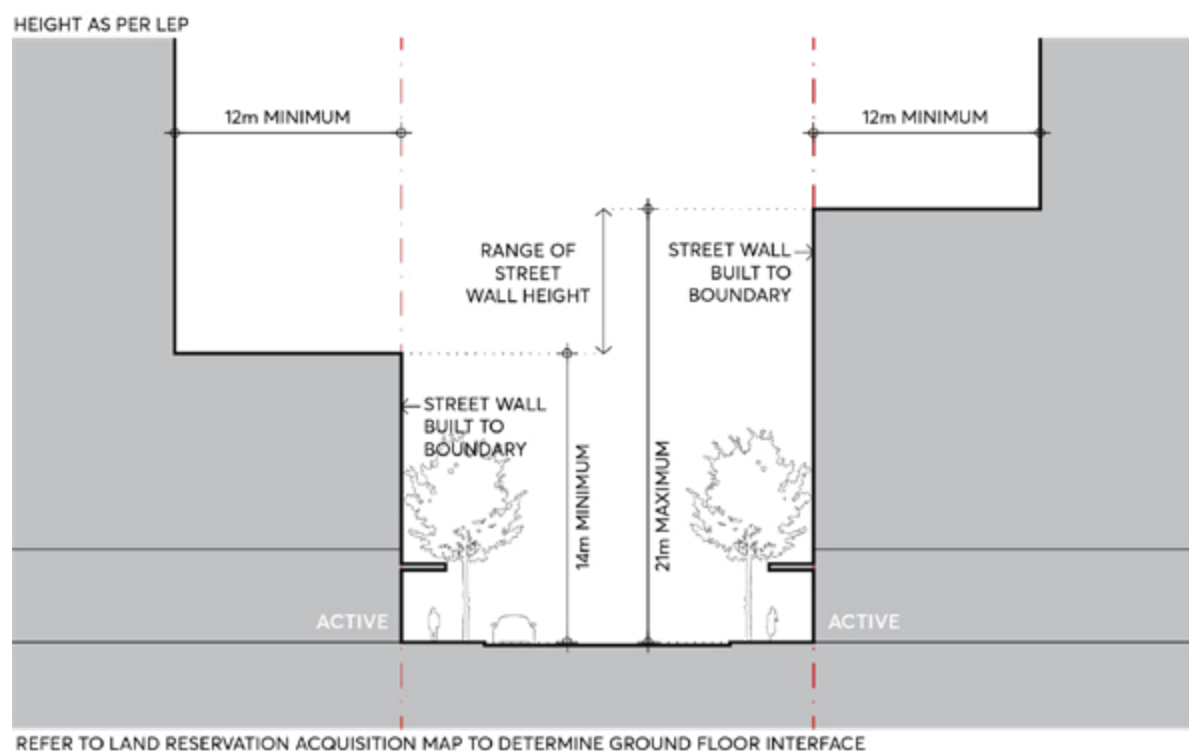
George Street - Street Setbacks and Street Wall Height
